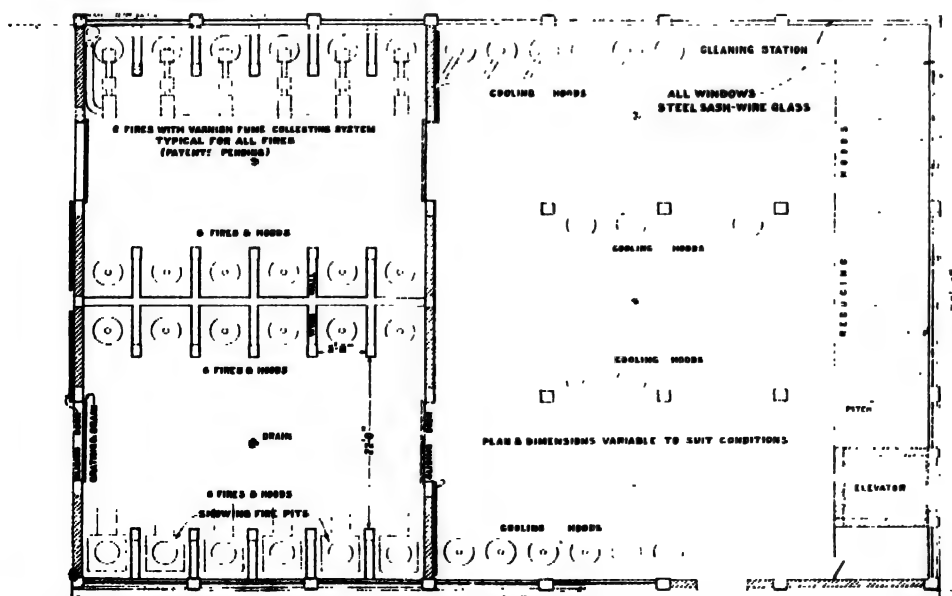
FIRST FLOOR PLAN 2-STORY, 24-FIRE, STACKLESS VARNISH PLANT
